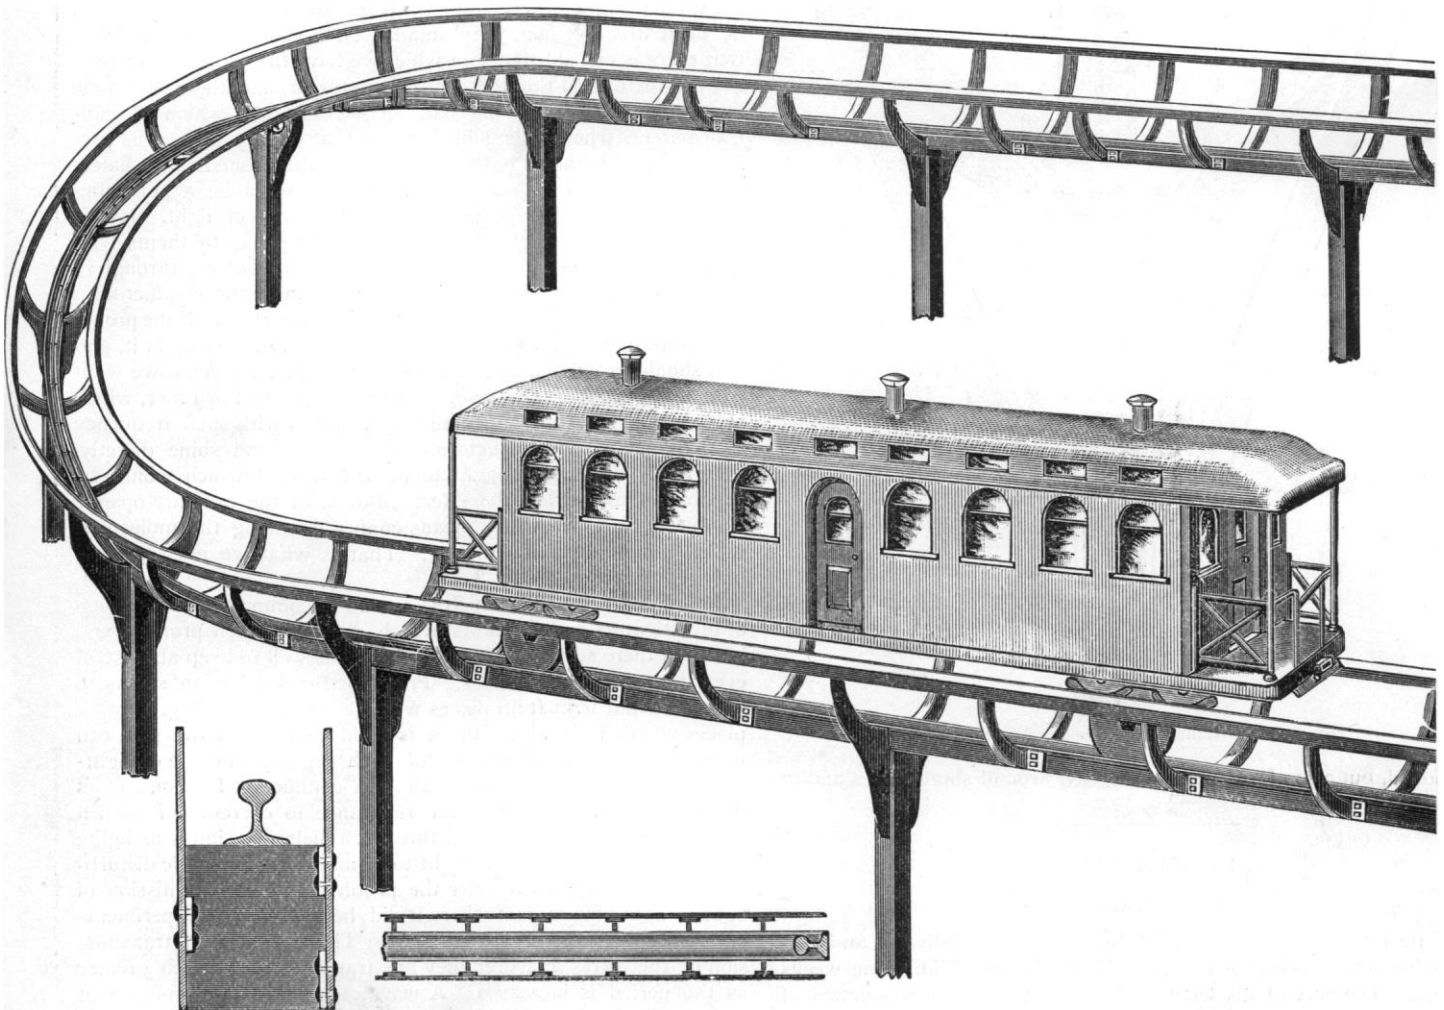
THE WHITE ELEVATED RAILROAD.
